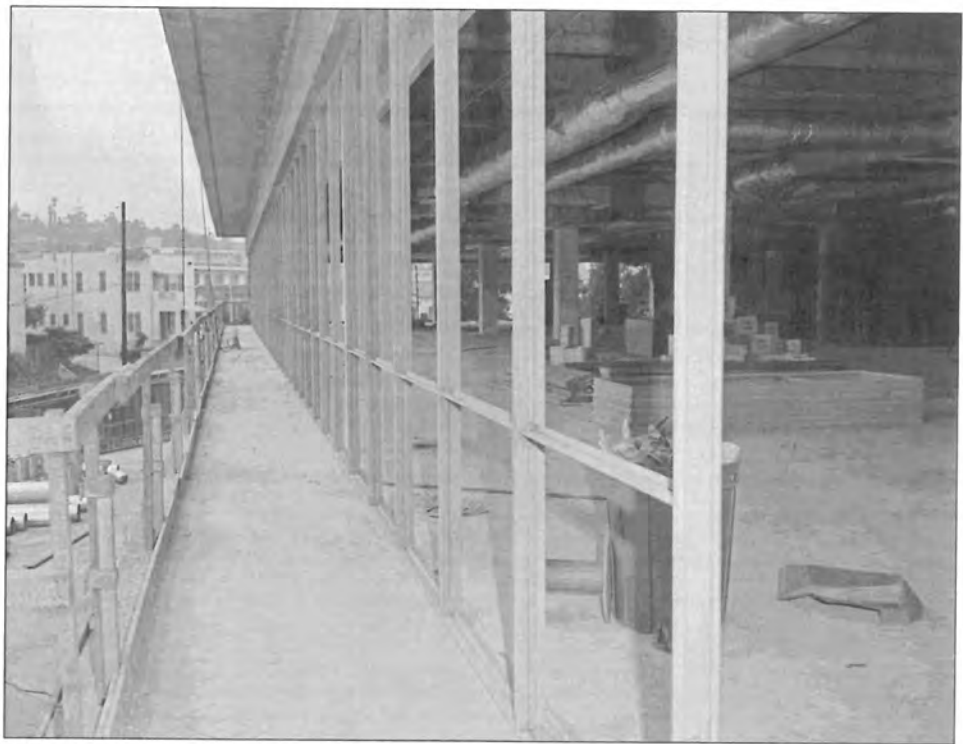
Annex during construction, note window sash installed showing two sections (MWD Archives, 1973)
